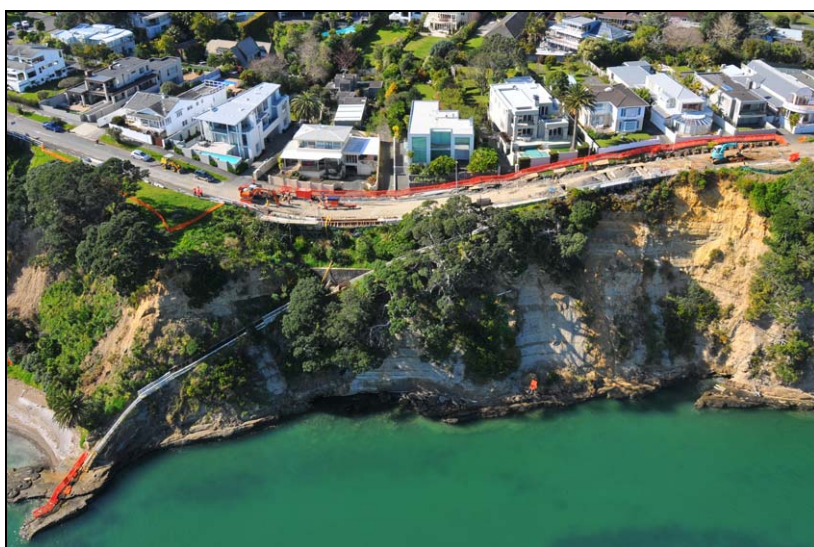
Aerial view showing engineering stabilisation works in progress at Cliff Road above Achilles Point (lower left) St Heliers, 4 September 2008. Rainfall during August caused small shallow slope failures (left) but did not adversely affect the area being stabilised.
